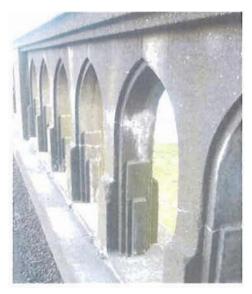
Balustrade at Yaquina Bay Bridge, 1936, illustrating Gothic arch opening framed by Art Deco setbacks *Source:* Author
